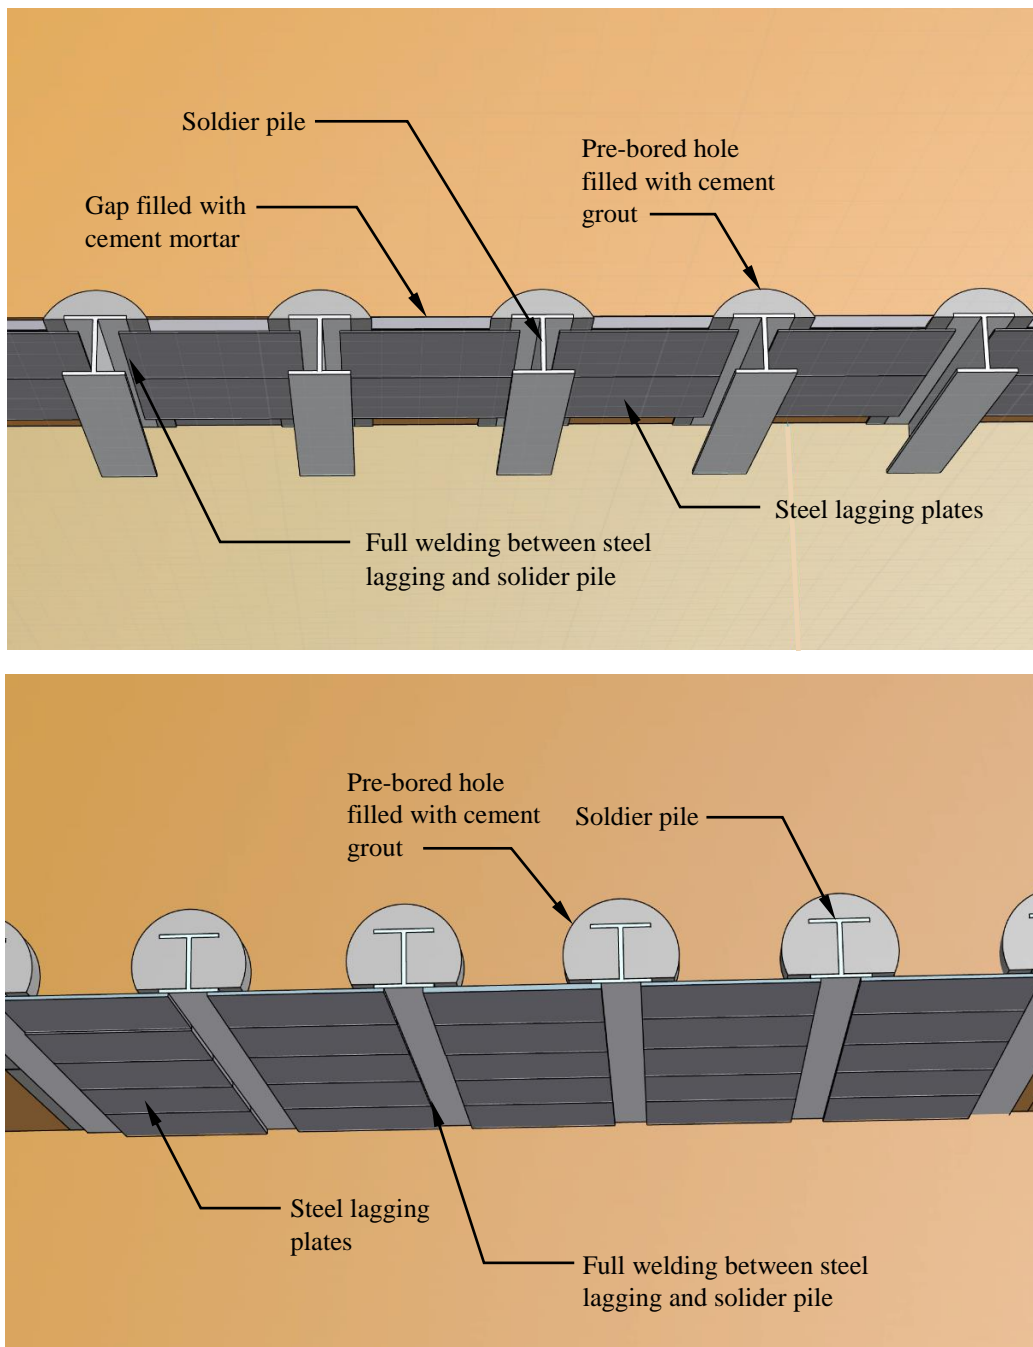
Typical Soldier Pile Wall with Steel Lagging
